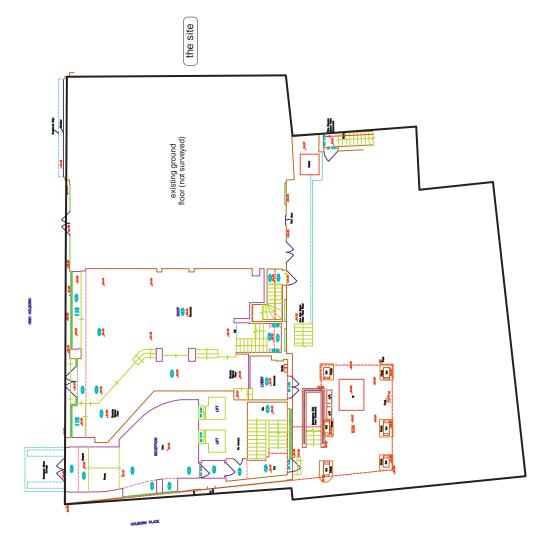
Existing ground floor plan (Plowman Craven, dwg no. 27996F-03, Rev B, 24.01.2013)
